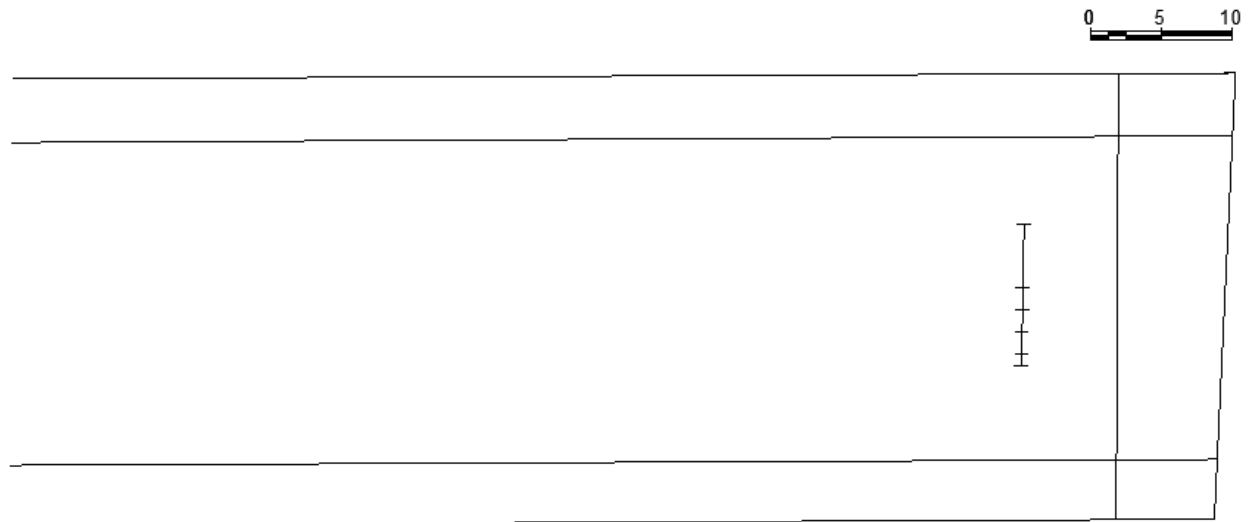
True long view of the 16N Stope hanging wall after Blast 9 prior to undercutting of extensometer 2.
